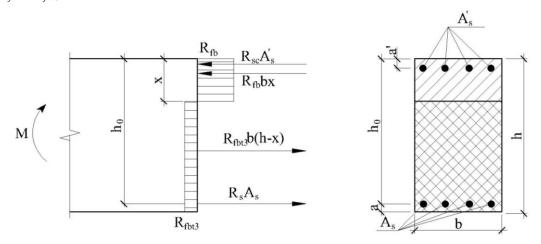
Diagram of forces and stress diagram in a section normal to the longitudinal axis of a bent fiber-reinforced concrete element of rectangular section with reinforcement, when calculating its strength.
